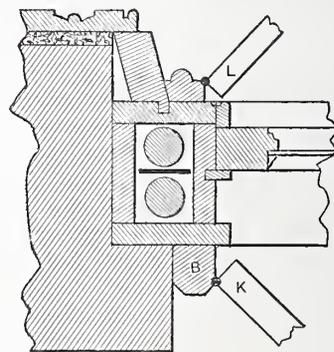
Horizontal Section Through Frame in Brick Wall.
